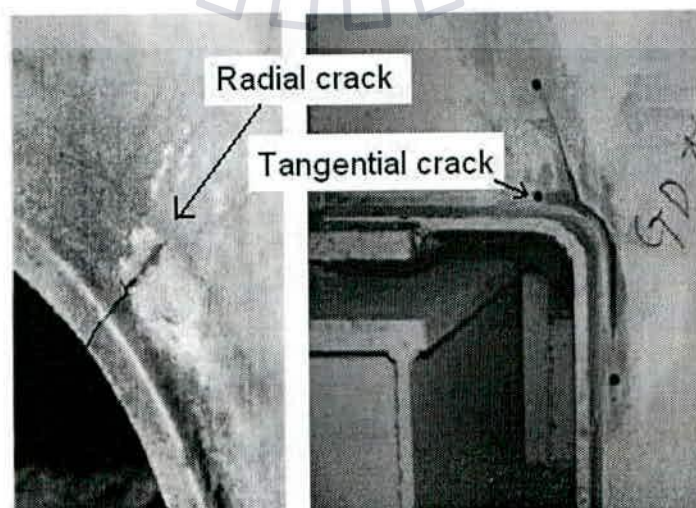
Crack propagating from coped girder (Haghani, et al., 2012)
